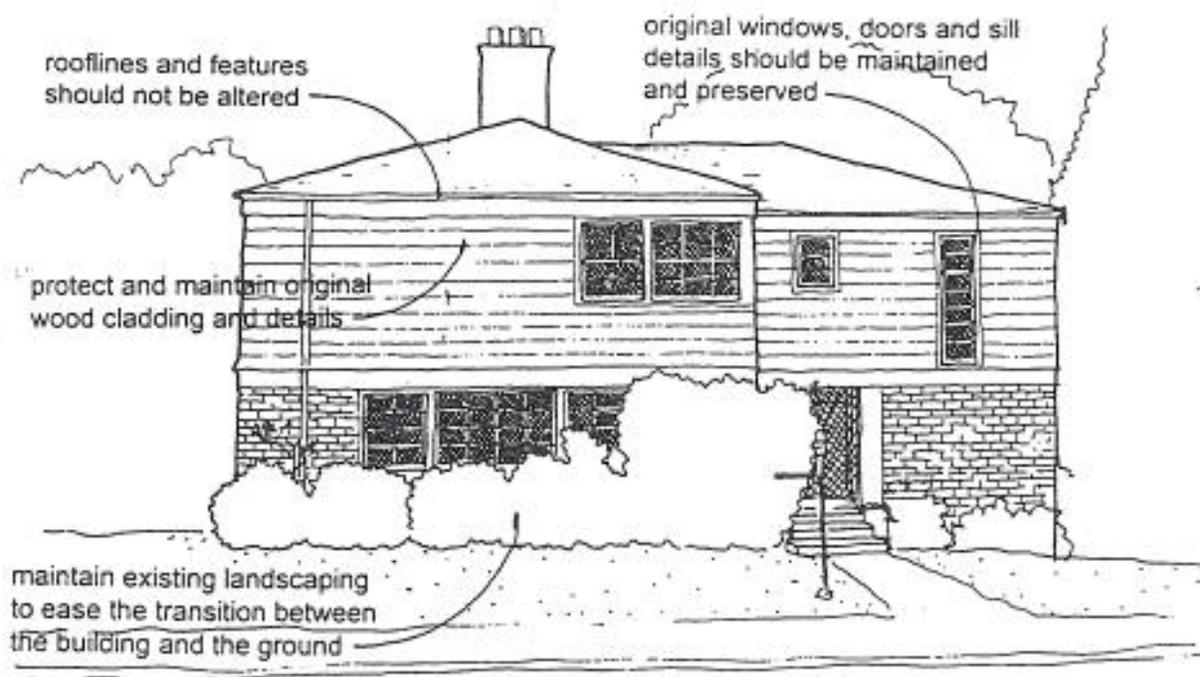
Buildings 330, 331, 332 recommendations
